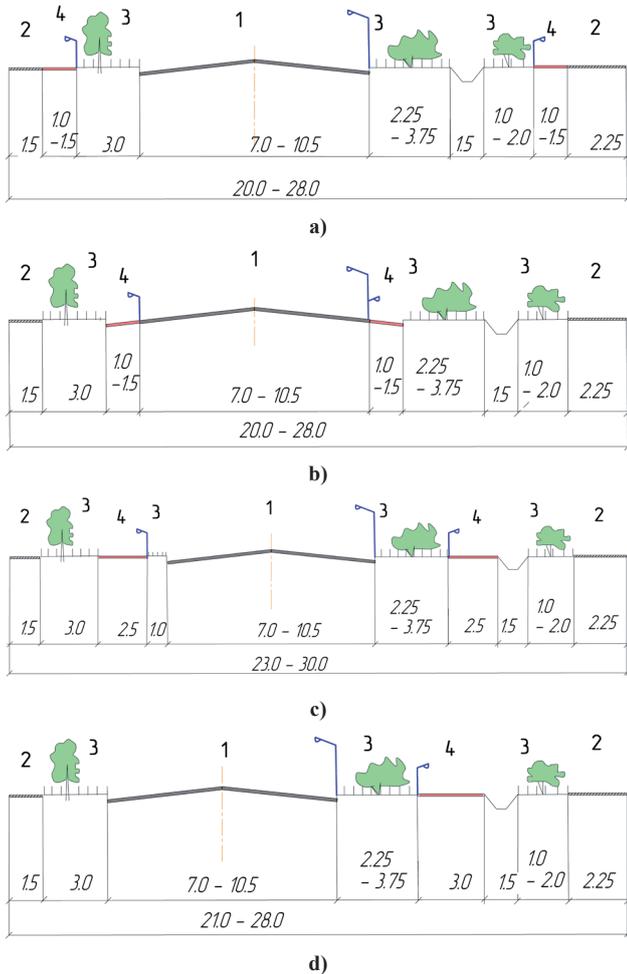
Typical cross-section of the main residential street (by DBN V.2.3-5 -2001. «Streets and roads of settlements»)
